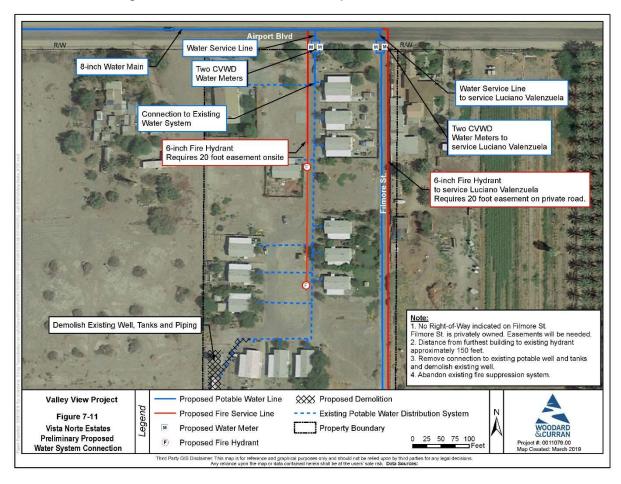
Vista Norte Estates Proposed Point of Connection
